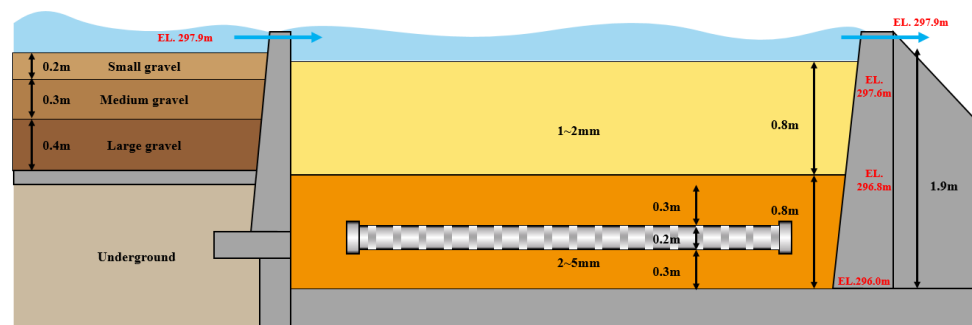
Cross section of existing intake reservoir (pond) and sand dam.
